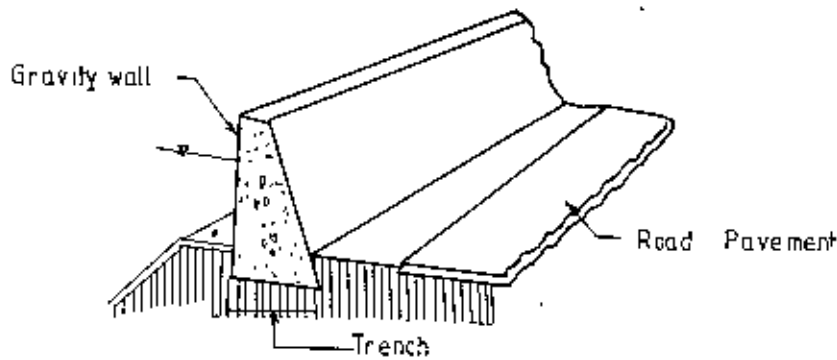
Typical Design of Flood Protection Embankment and Wall of GDFCD Project
